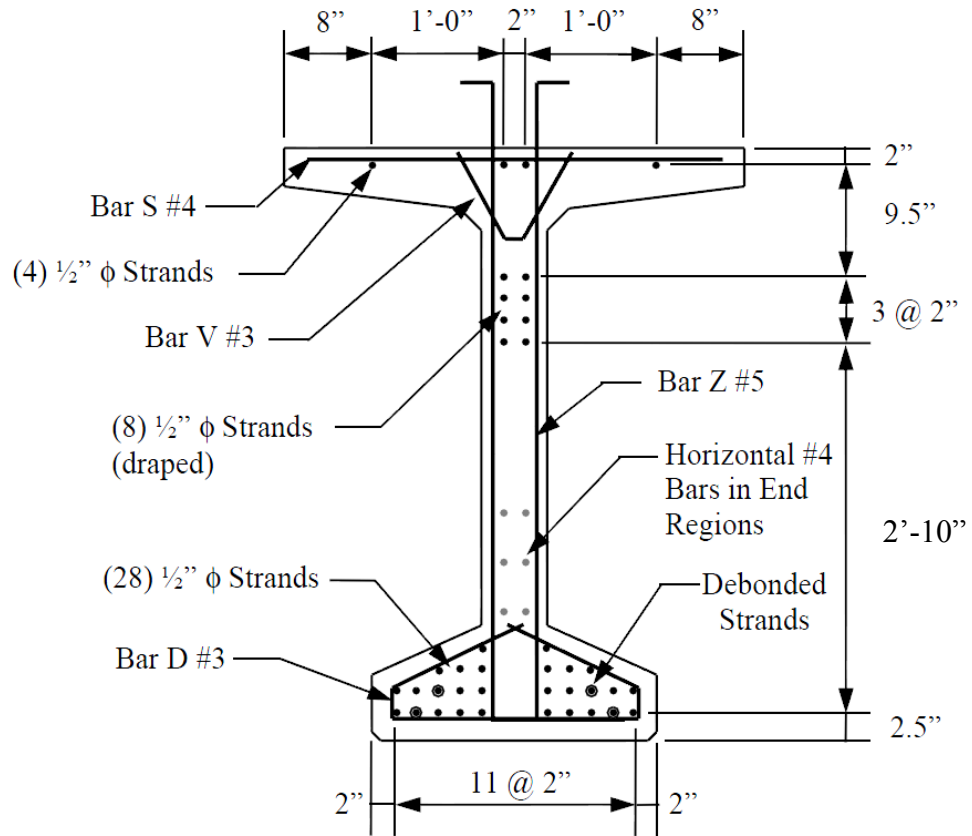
Mild steel and strand arrangement at the ends of each BT-54 girder.
